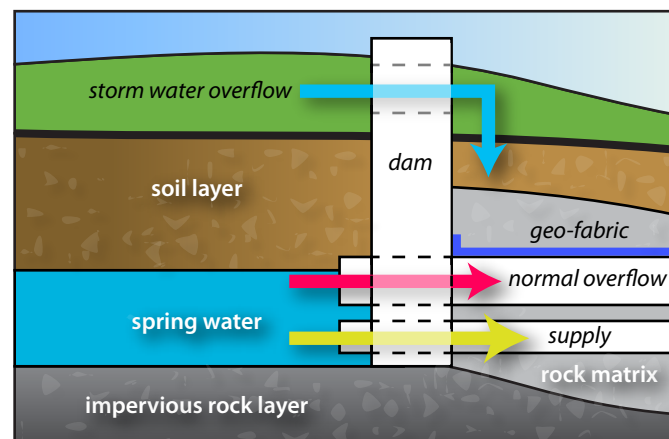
Typical spring head installation components include geotextile fabric, overflow and supply piping, and rock.
